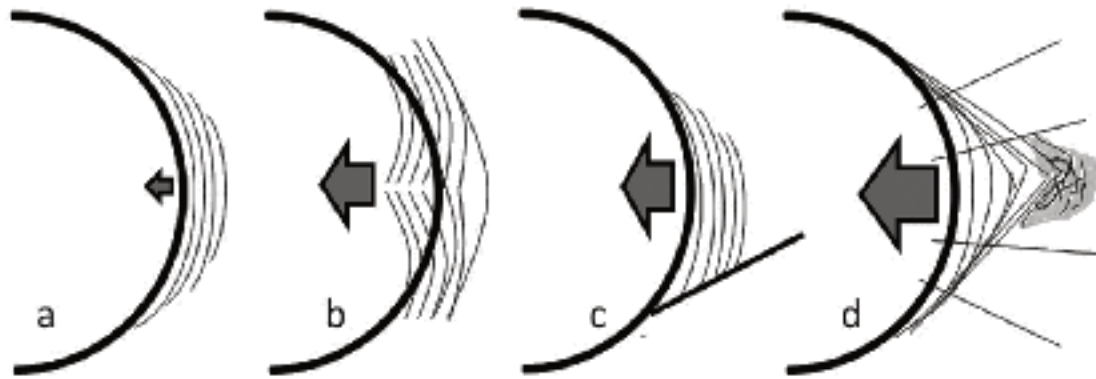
Progressive development of sidewall spalling, buckling and tensile fracturing of sidewall spalls, and notch formation (after [Loew et al \(2010\)](#))
